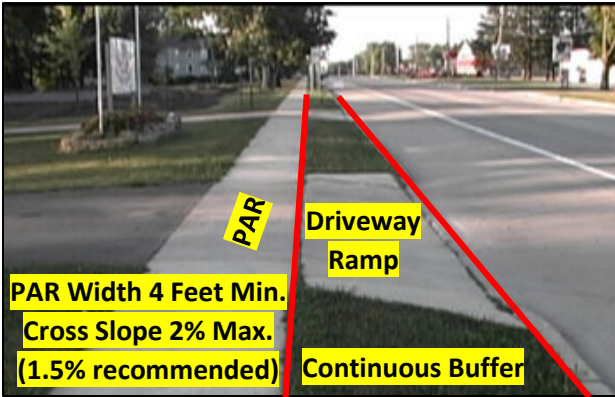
Maintain PAR Location and Place Driveway in Adjacent Buffer
